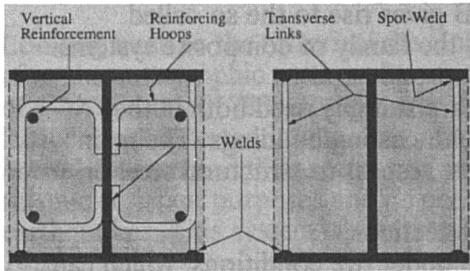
Partially encased beam-column sections (Elnashai, 1996).
